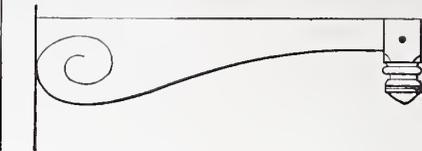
Bracket on Octagon Corners of First Story.—Scale, 1/2 Inch to the Foot.
